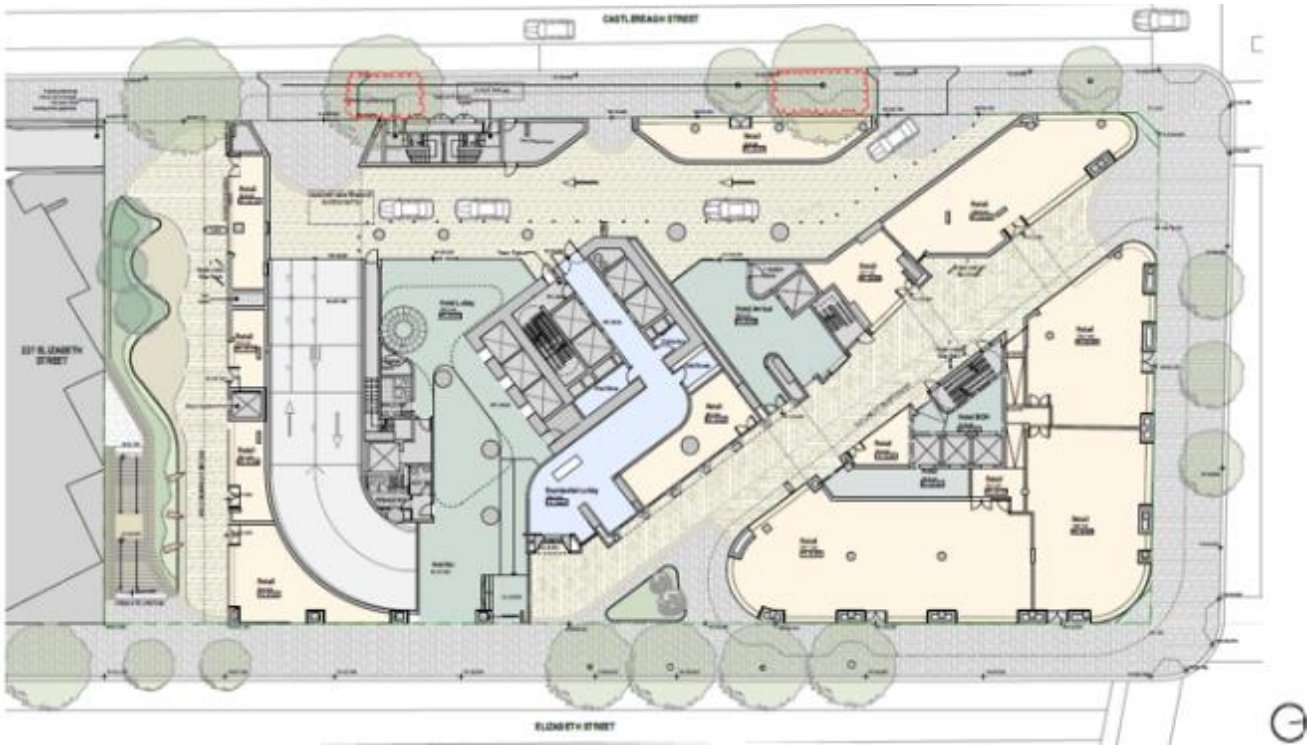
| Proposed ground floor (Source: Ethos Urban RtS amended architectural drawings)
